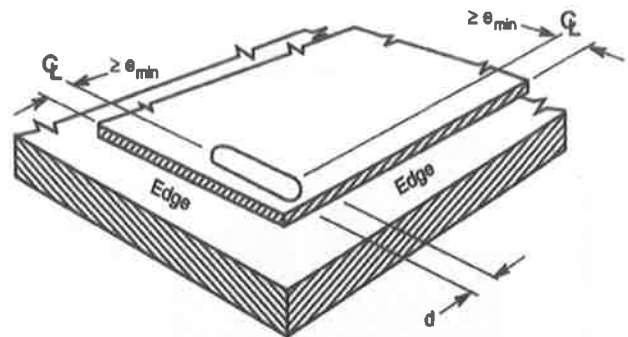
Edge Distances for Arc Seam Welds
